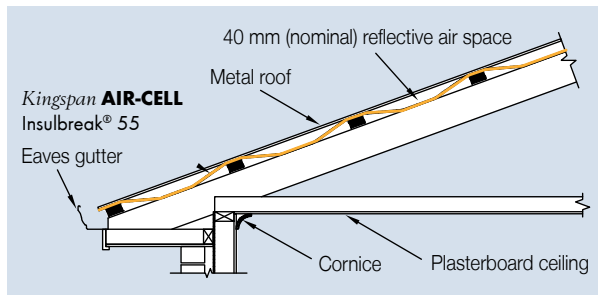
Side elevation of *Kingspan AIR-CELL Insulbreak® 55* in a metal roof with an attic space and flat ceiling
